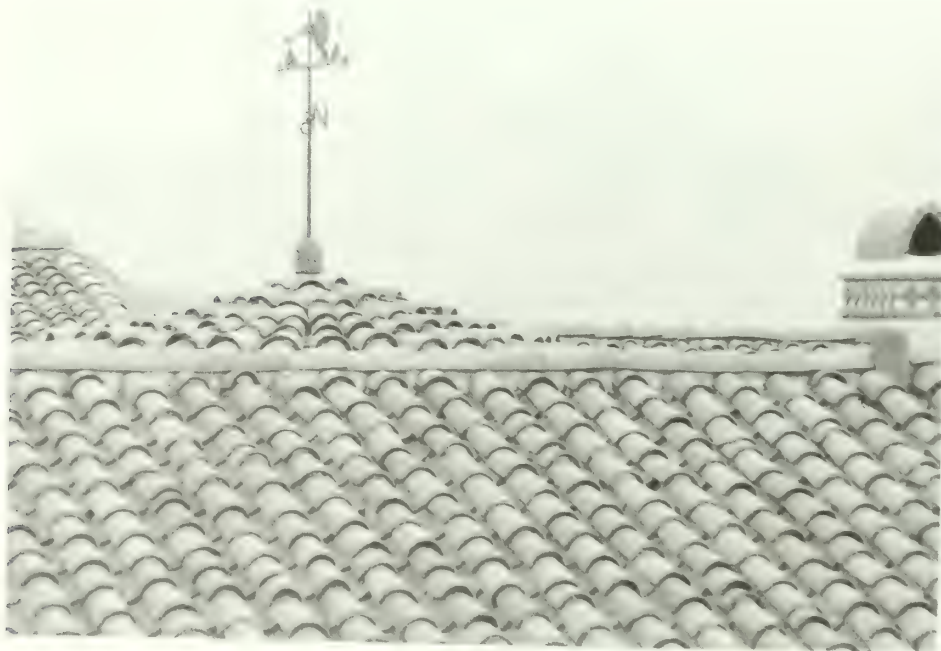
Roof surfaces detail, north side of Annex. Note tiles beneath ridge with possible reverse pitch; also tile plumbing vent at right. Photo by R.L. Carper, April 1989.
